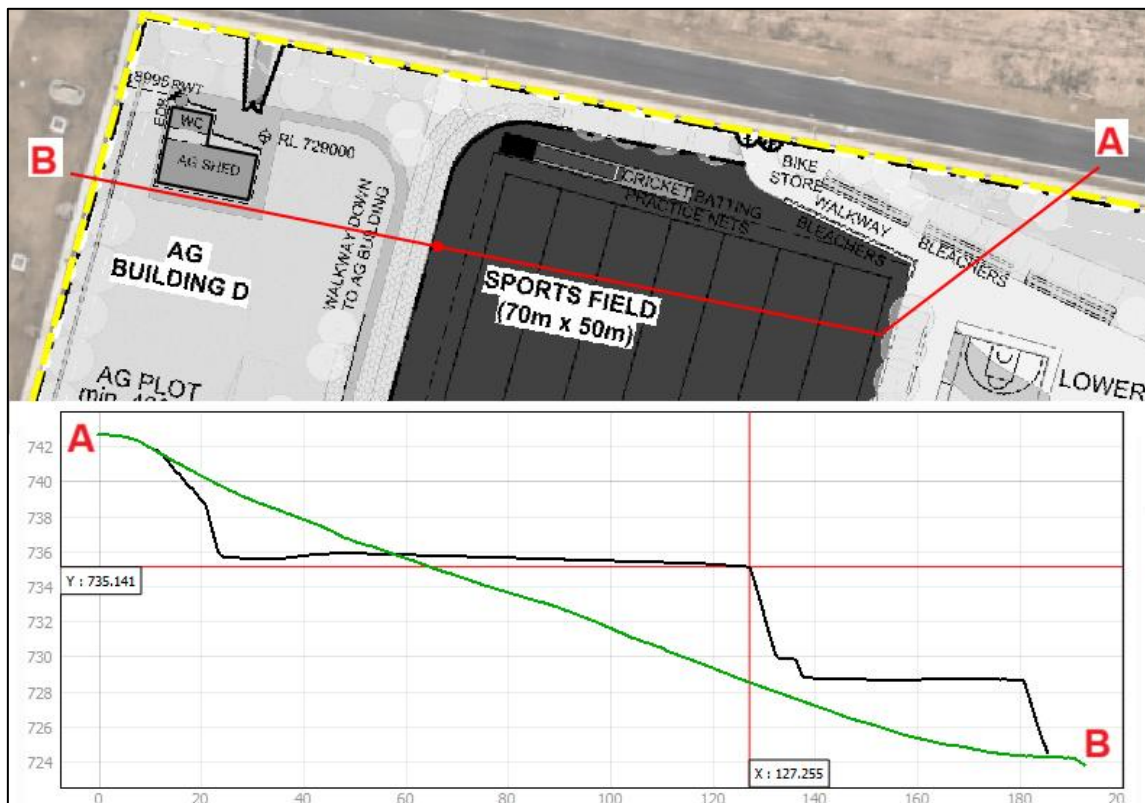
Cross-sectional profile from Bridget Ave (Point A) towards the drainage reserve (Point B)
